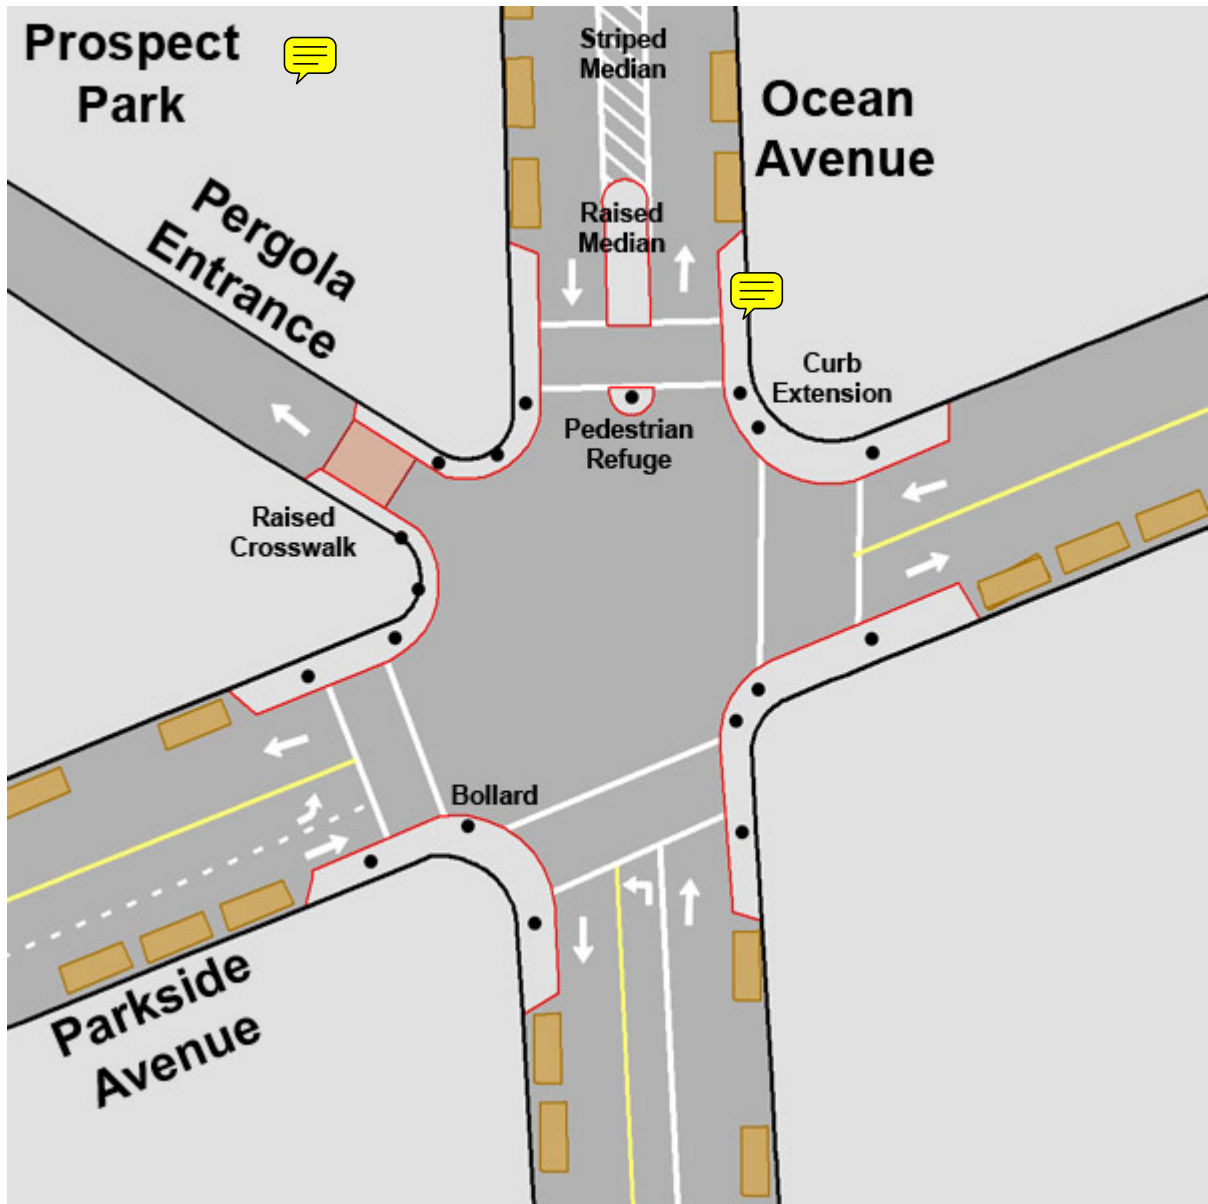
Drawing of Parkside Avenue and Ocean Avenue intersection with curb extensions, raised crosswalk, raised median, pedestrian refuge and bollards
